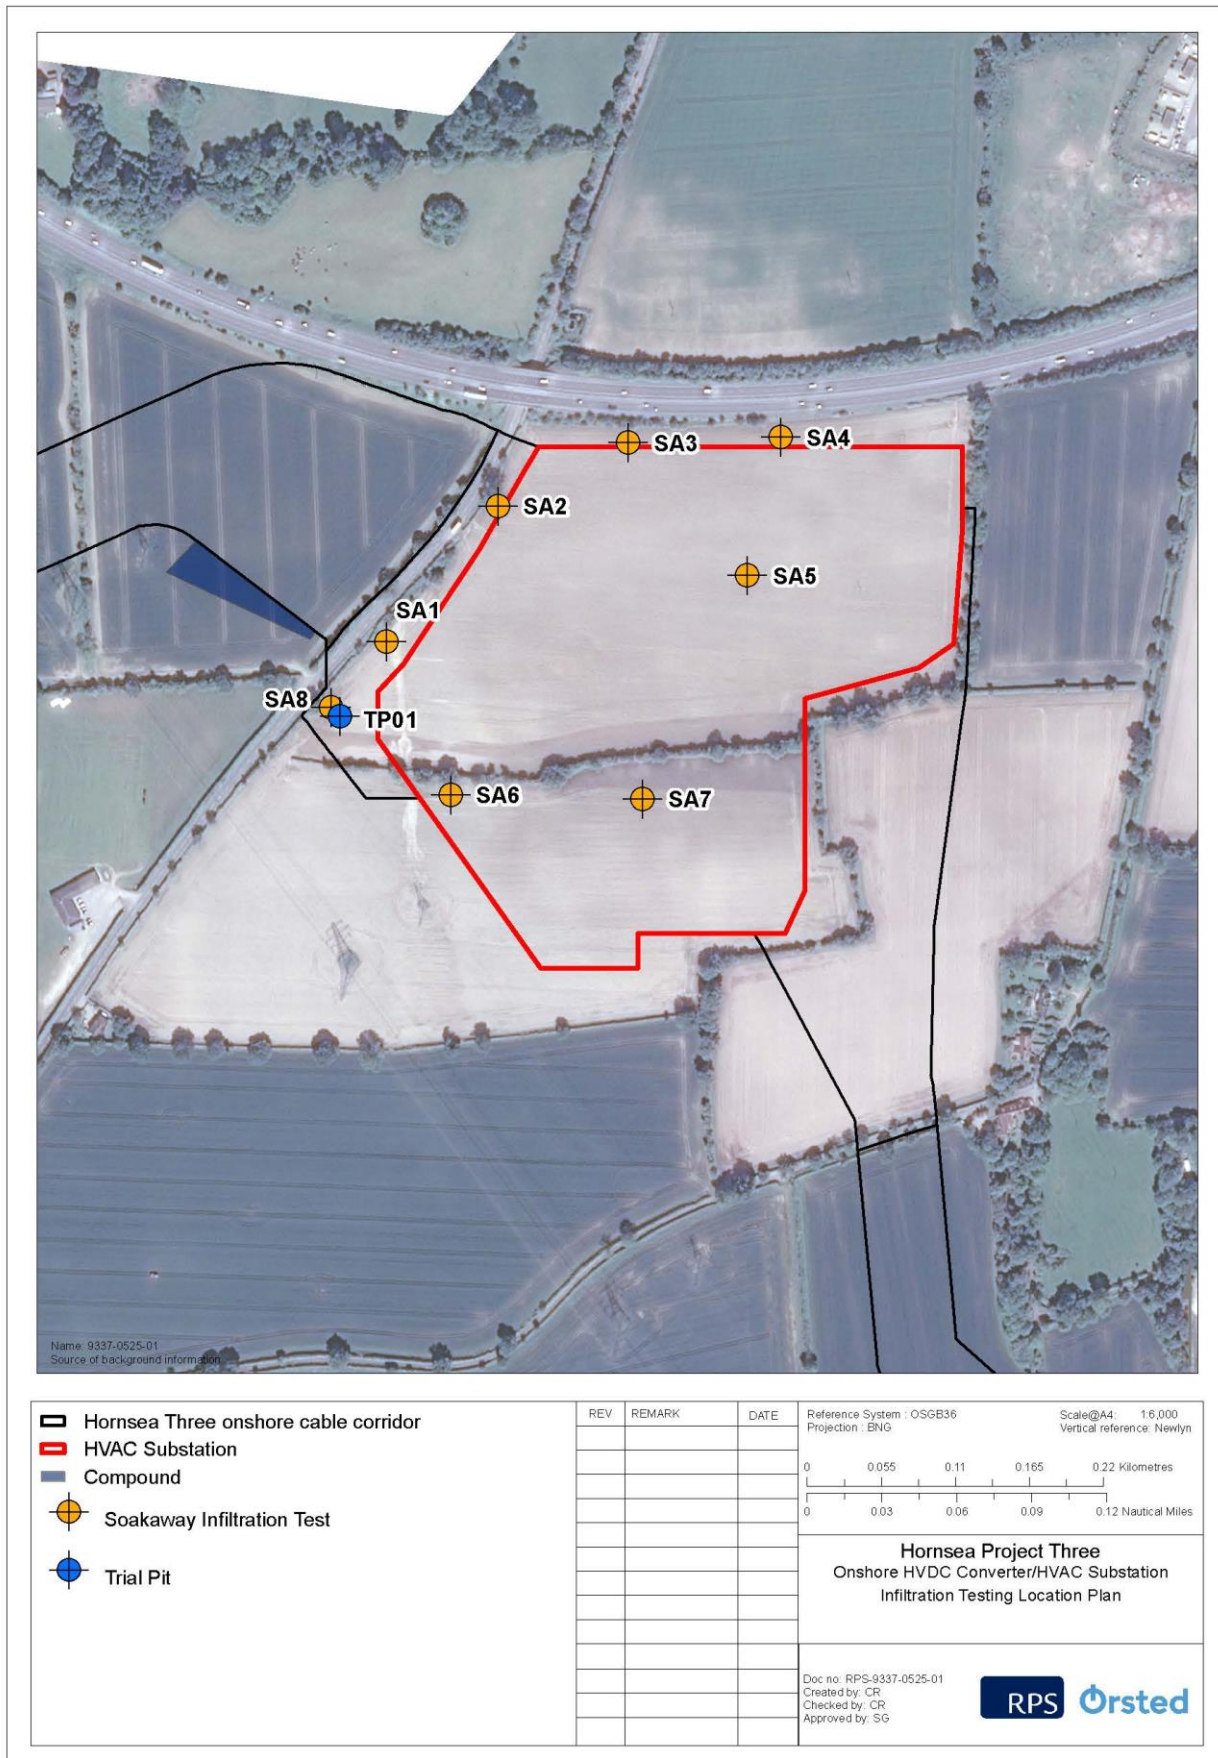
Onshore HVDC Converter/HVAC Substation Infiltration Testing Location Plan.
